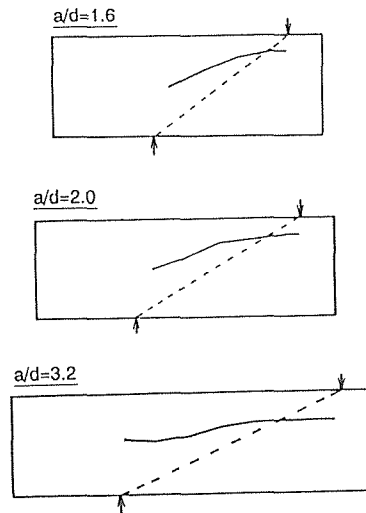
Position of Neutral Axis of Reinforced Concrete Beams
